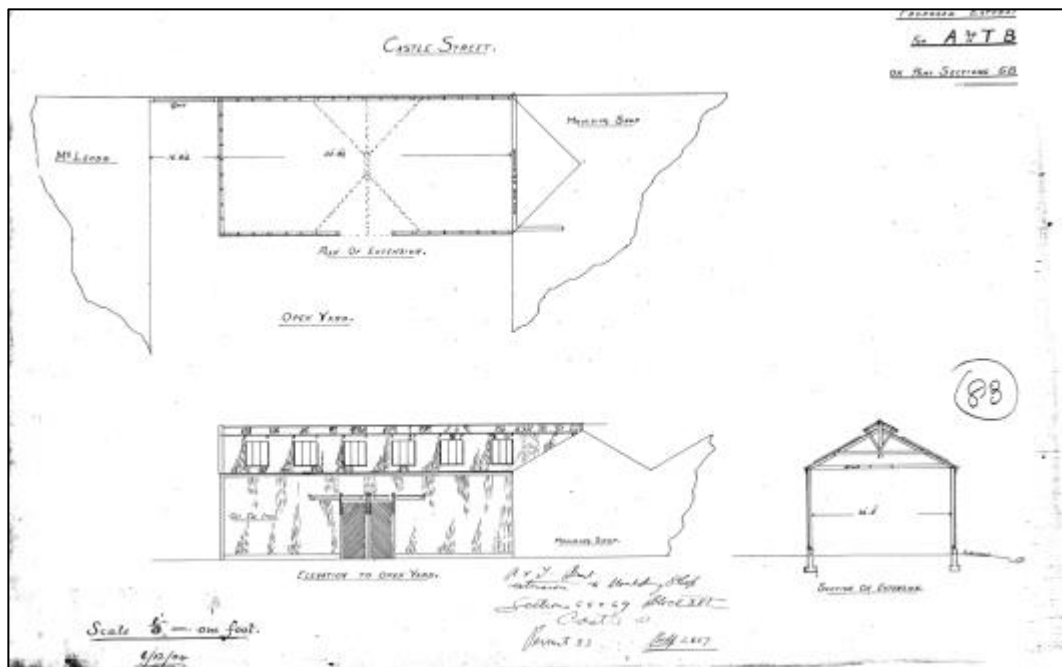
1904 plans for the northern extension to moulder's shop not constructed (DCC Archives).
